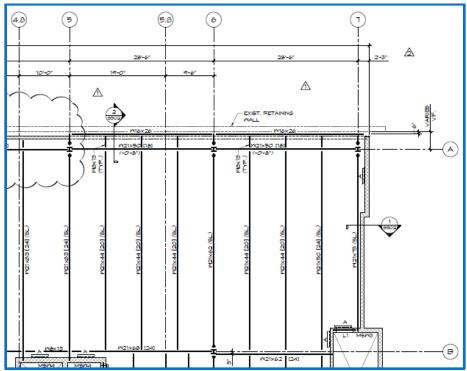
Close Up of North-East Corner of Steel Framing Plan
